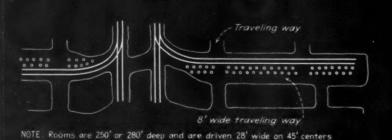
Track and timbering plan in a power-shovel room at Kathleen.
